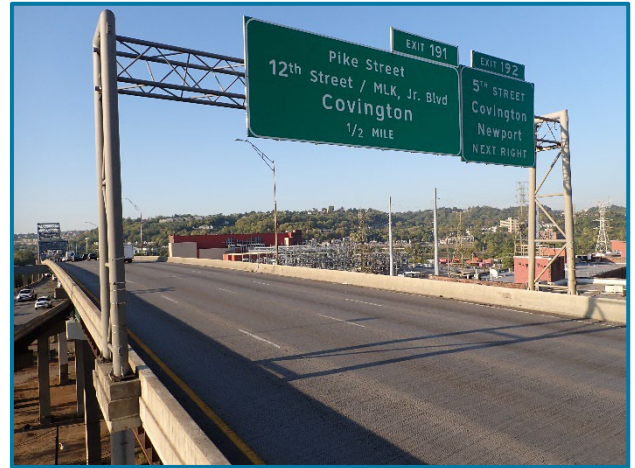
Exit signs mounted in Span 16A (looking southwest).
